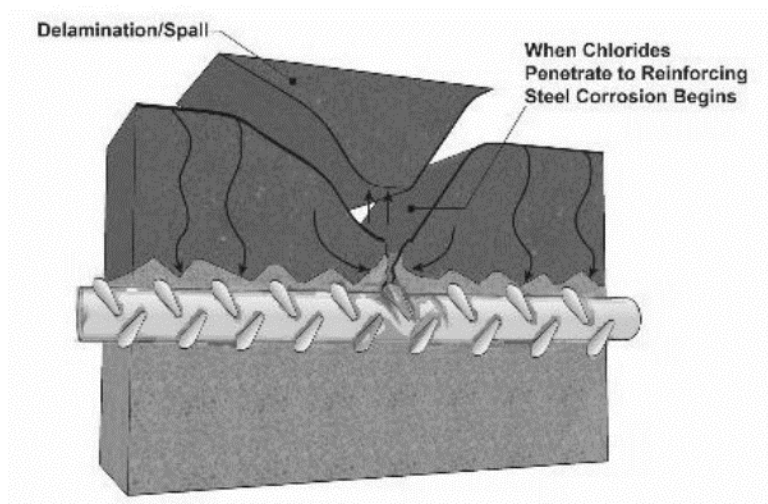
Illustration. Delamination/spalling of deformed tie bar due to applications of chlorides from deicing salt (Harrington et al. 2018).
